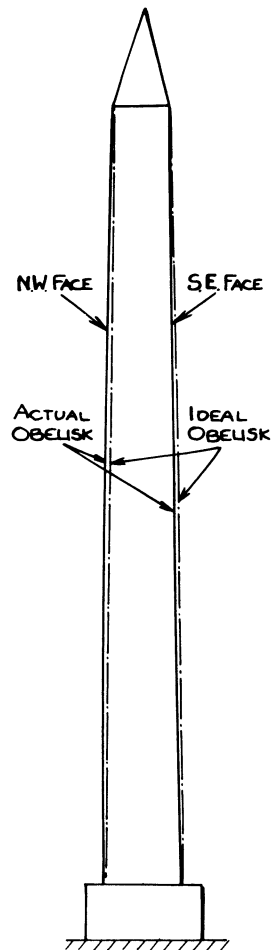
Side elevation, showing the bowed north-west and south-east faces.
